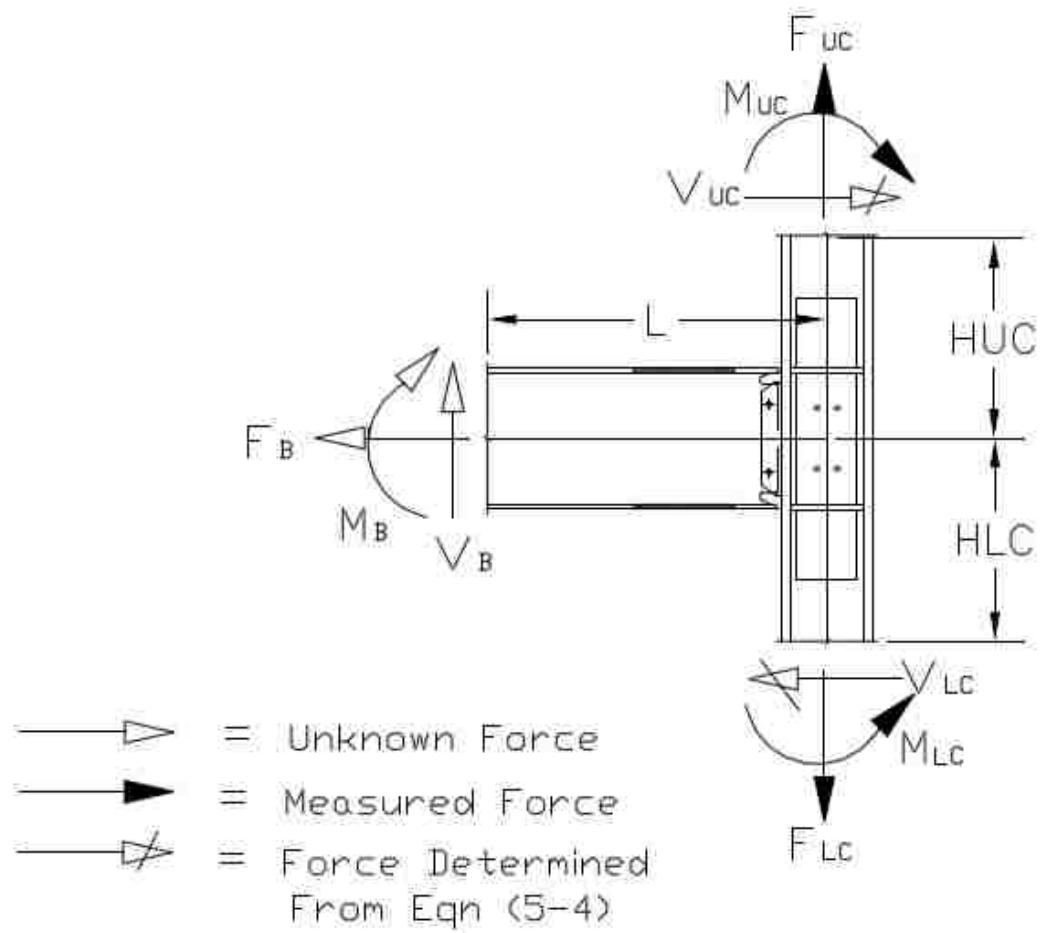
Typical Free Body Diagram Used to Calculate MRF Beam Forces and Column Shear Forces (Forces Shown Acting Positive Sense)
